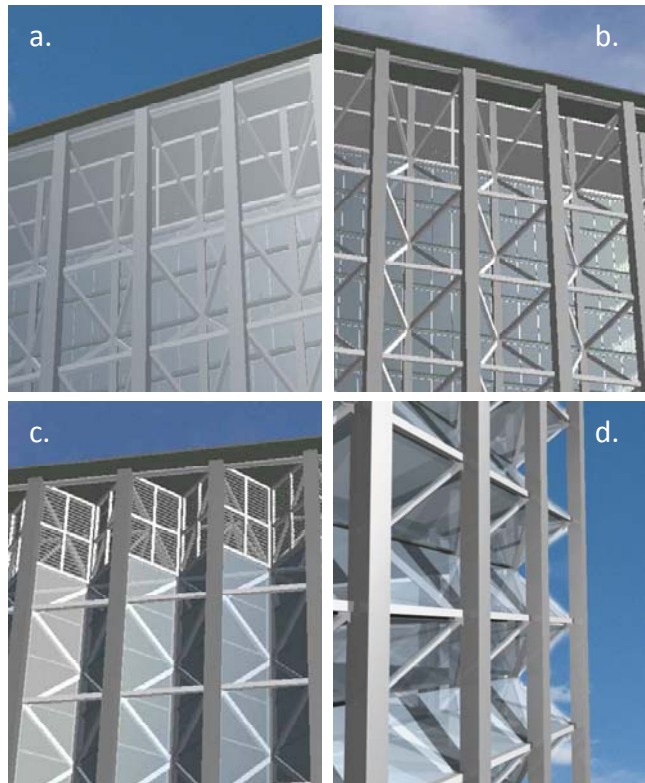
(a) Double-skin façade; (b) Exposed structure; (c) Vertical folded façade; (d) Horizontal folded façade
